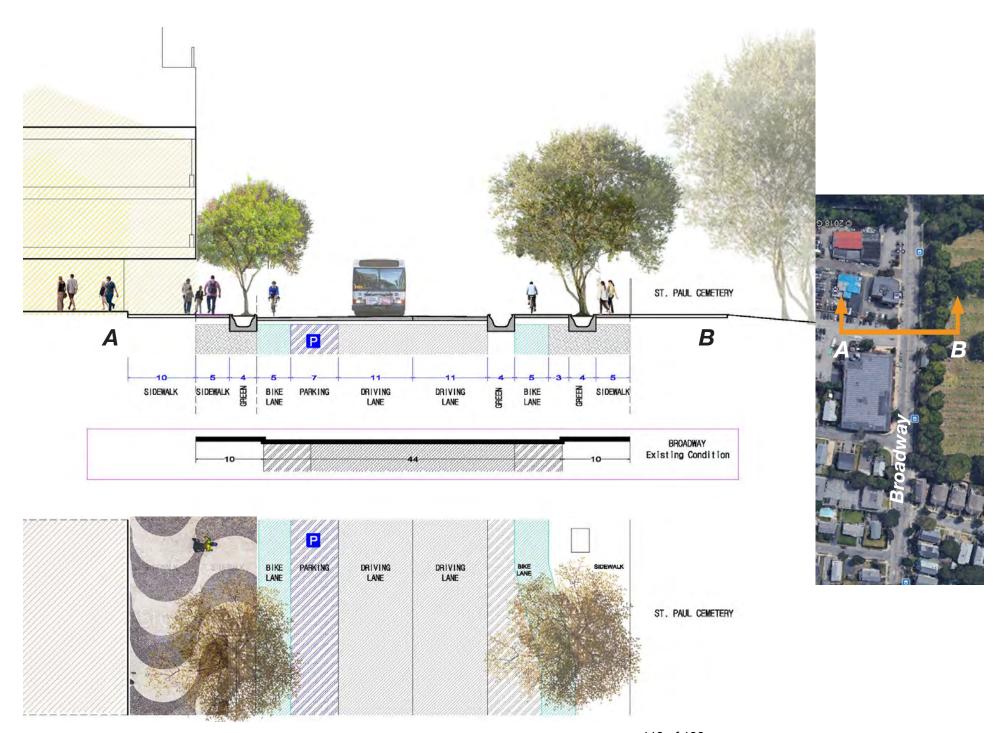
Streetscape example with bicycle lanes along both sides of the street and parking only on the north side of Broadway, adjacent of the Baney Building site.
